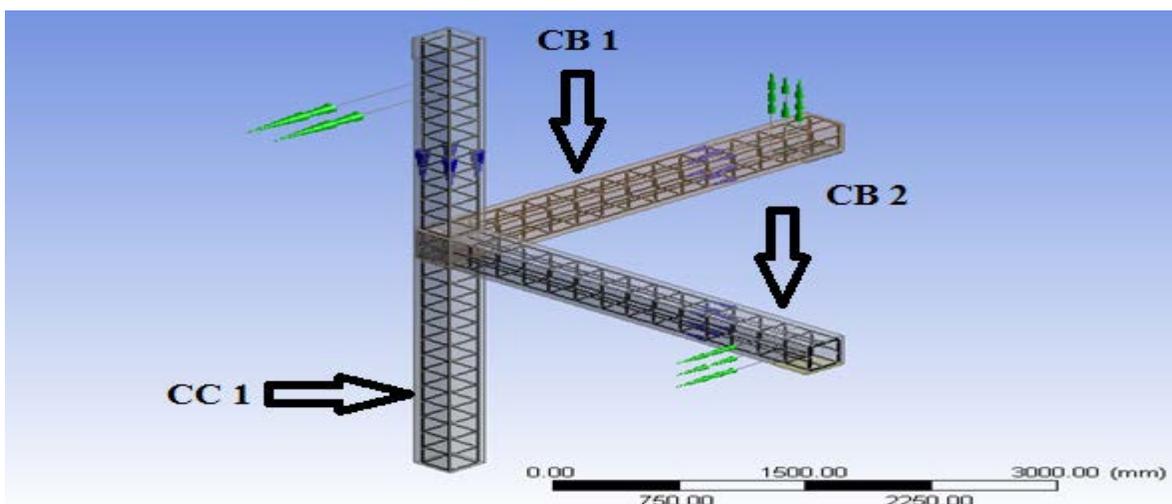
Geometric model and reinforcement detailing of joint with two beams (CS2)
